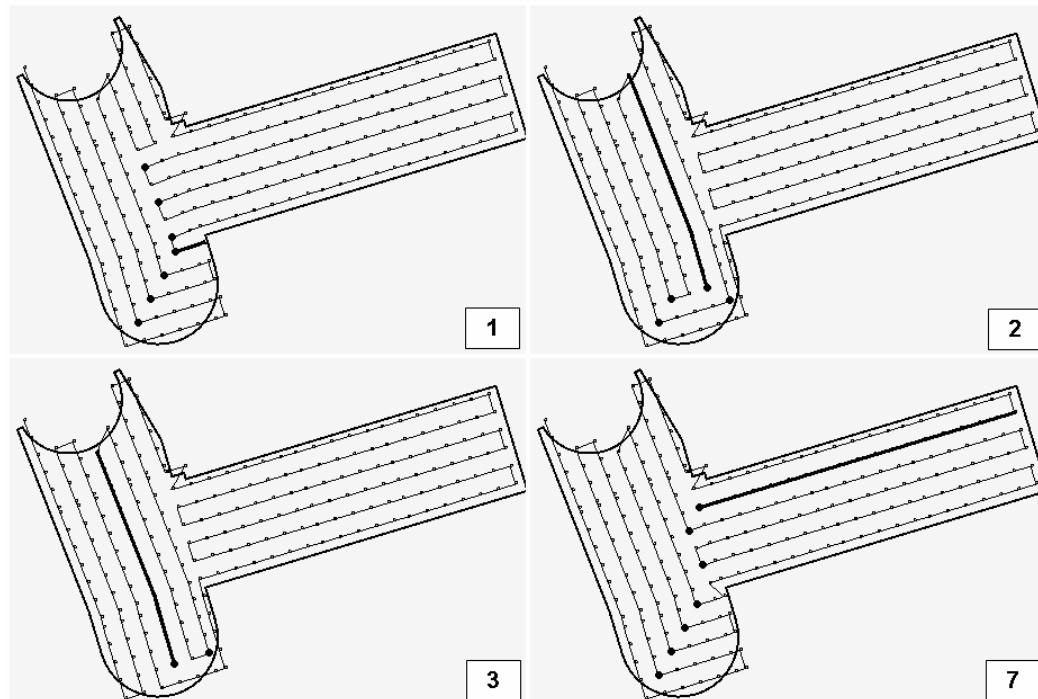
Dredging into previously excavated areas – Engineering application.
